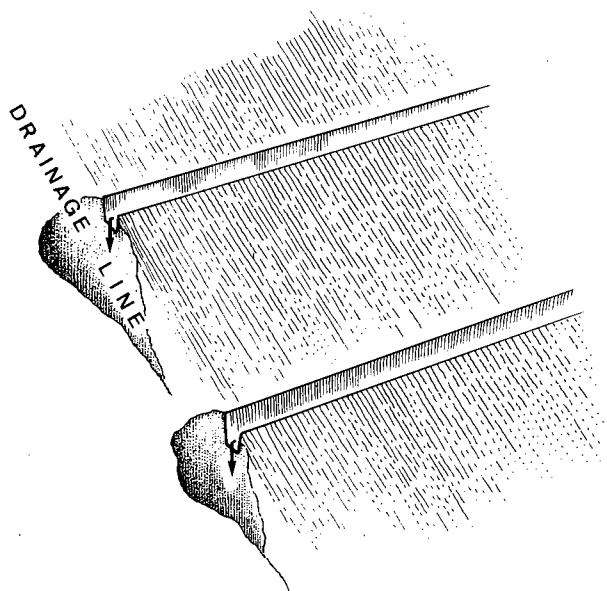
Ravines where drainage trenches end in a main drainage line.
